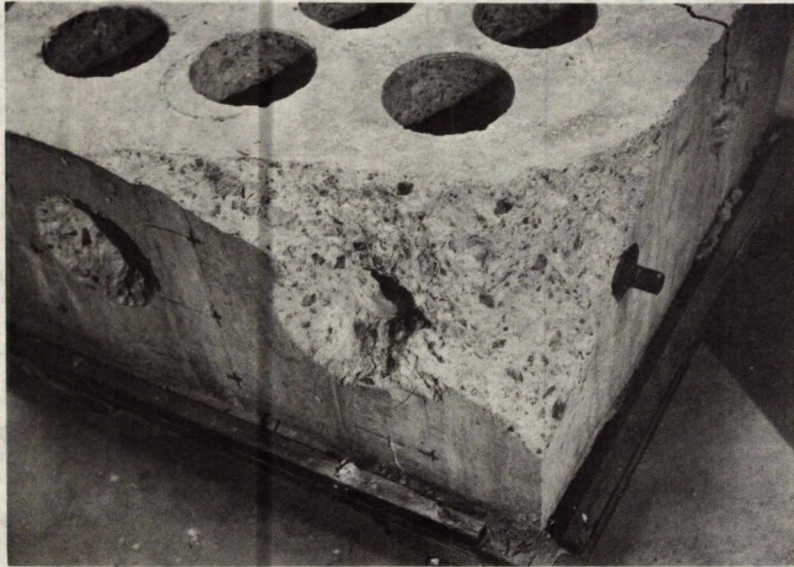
A close-up view of a damaged high-strength concrete block after the pull-out test.
